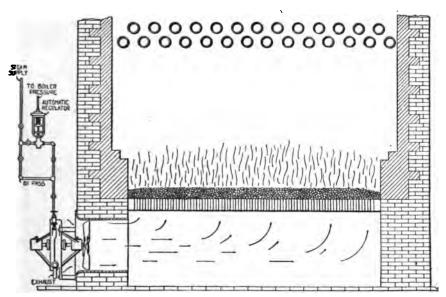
Section Through Boiler, Showing How Blower is Installed
